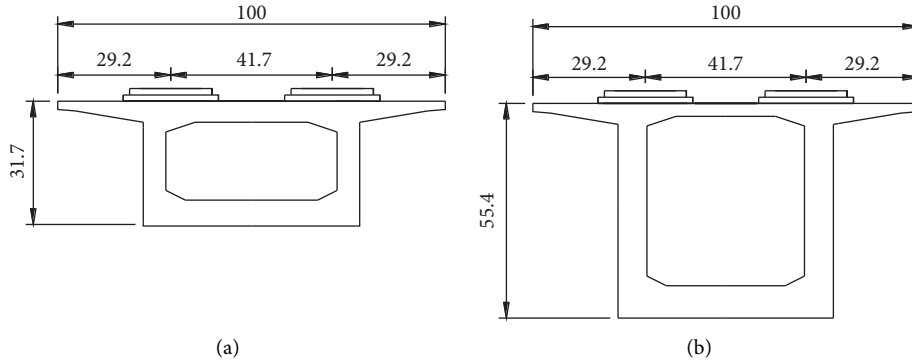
Specimen of girder section for (a) minimum section and (b) maximum section (unit: cm).
